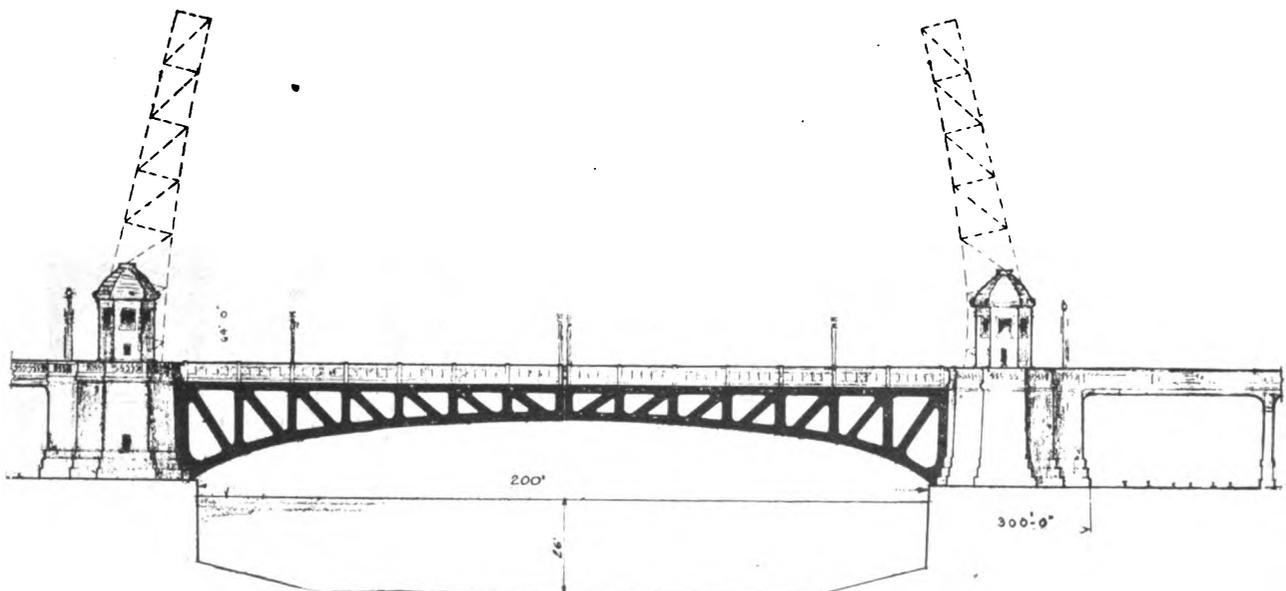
Bascule Bridge, New Scheme, Over New Channel.
